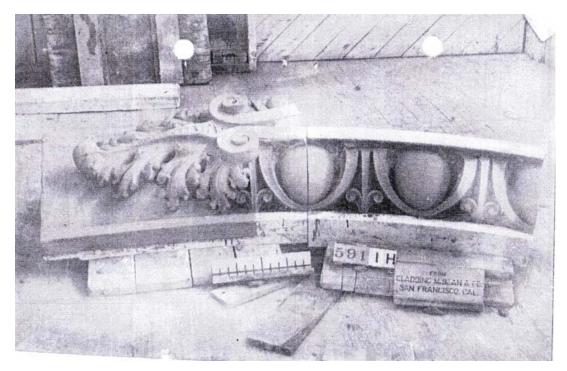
Photograph of clay model of terra cotta egg and dart molding surrounding 9th floor window arch frame, taken at the Gladding McBean factory in Lincoln, CA, December 15, 1903.
